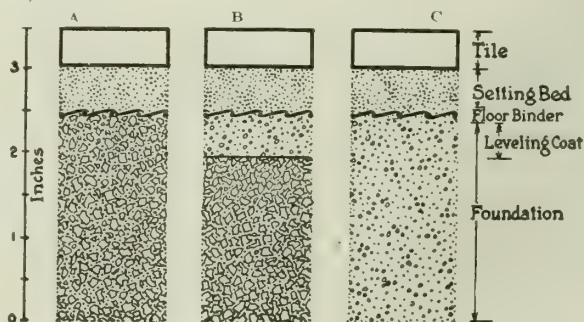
FOUNDATIONS FOR FLOOR TILE
